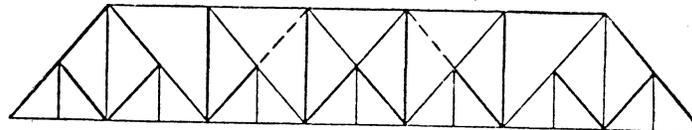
Baltimore/Petit truss, a Pratt truss having subdivided panels. (From Bridge Engineering, James A. L. Waddell, p. 469.)
